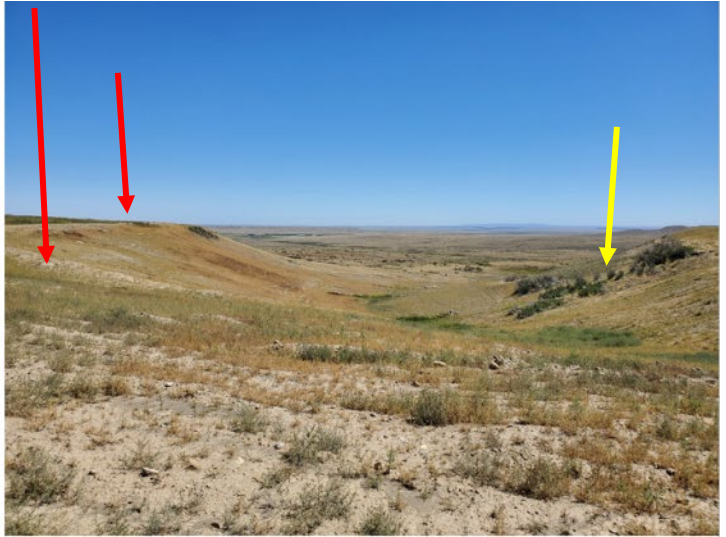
Looking east at a recently reclaimed area. The slopes have been backfilled, graded, and topsoiled. The Operator has installed berms (red arrows) surrounding the area that lead to check dams (yellow arrow) to encourage water to flow through controlled mechanisms.
